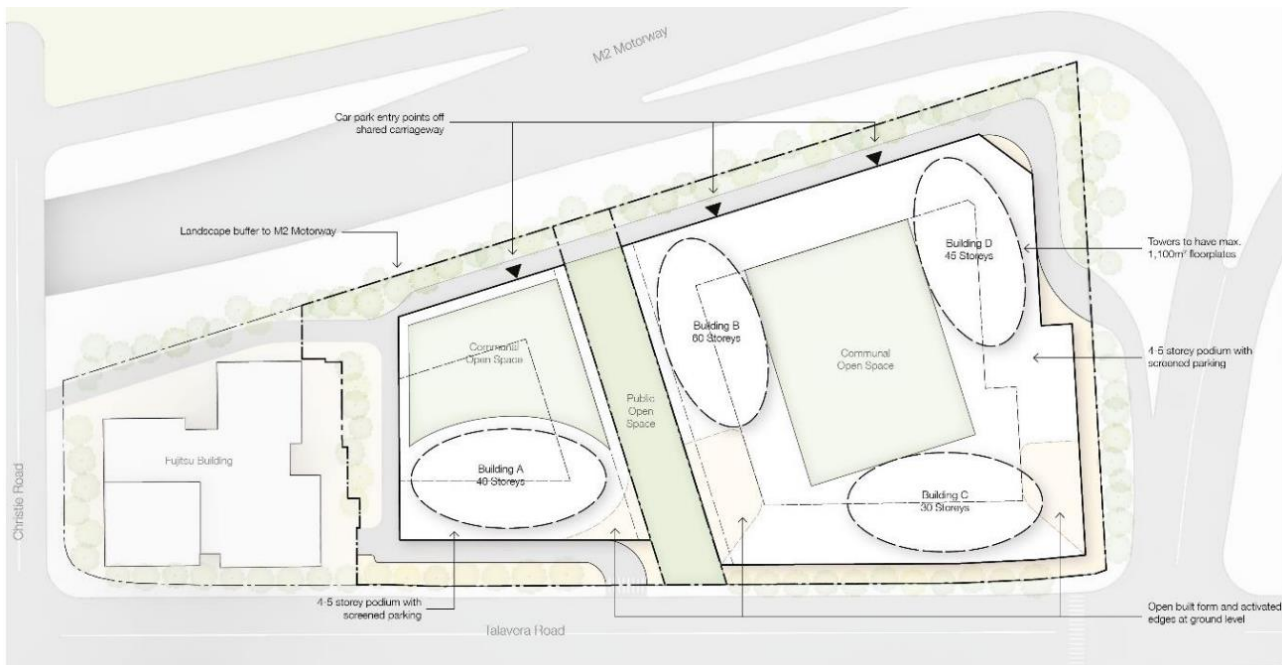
Planning Proposal (as exhibited) - Indicative site layout (Development site – western portion)
